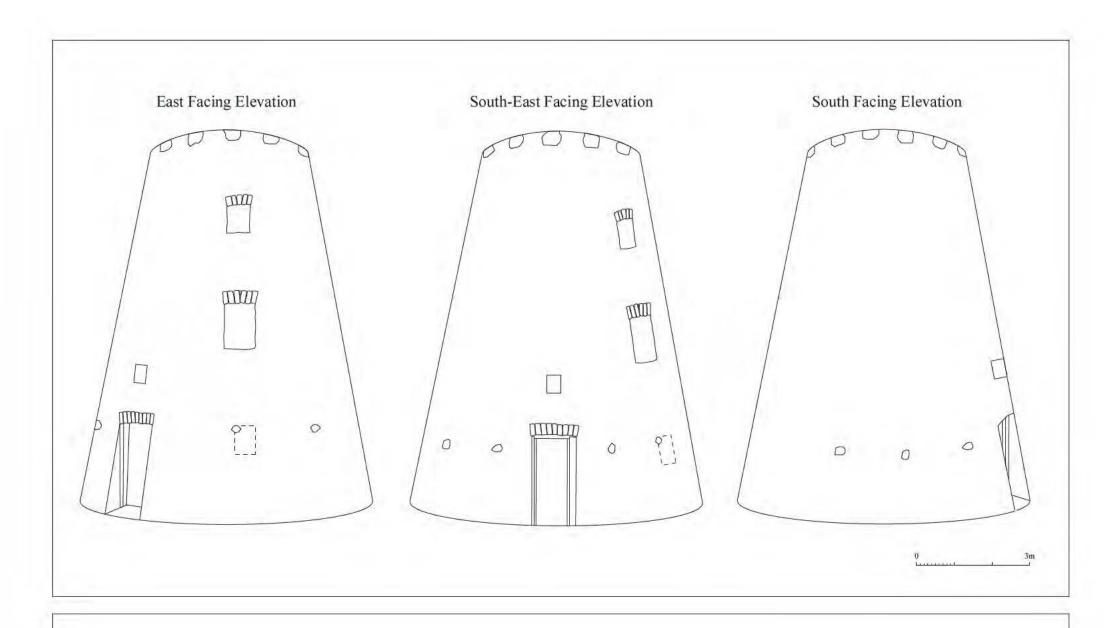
Windmill Tower Elevations East - South Facing, Scale 1:100. Drawn by C. Rees
